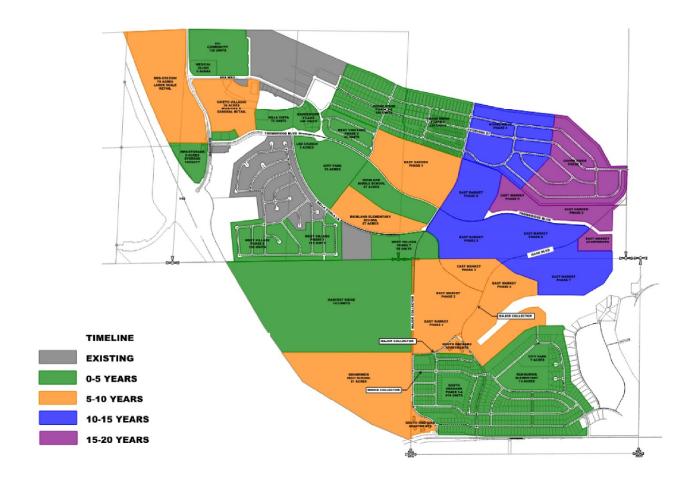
Preliminary Site Plan for Full Buildout of BMS
